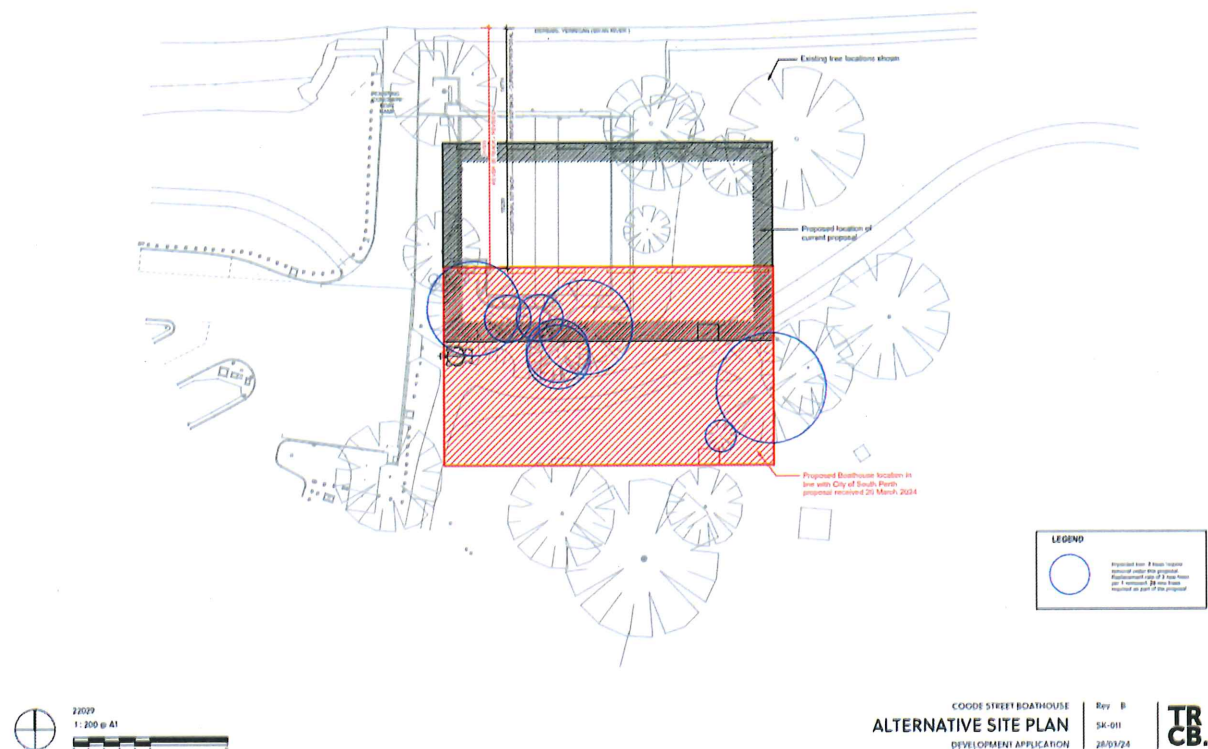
Amended site plan detailing foreshore setbacks (28 March 2024)
